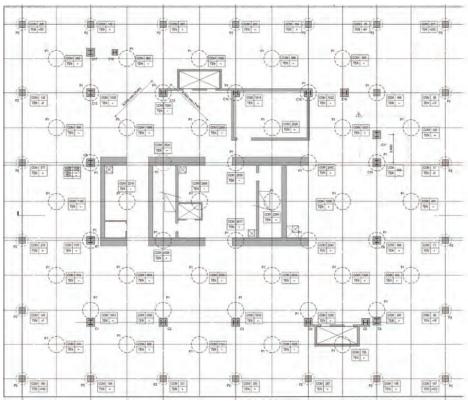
Foundation plan (Source: Heerim Architects & Planners) 图10. 基础结构平面图(来源:Heerim Architects & Planners)
